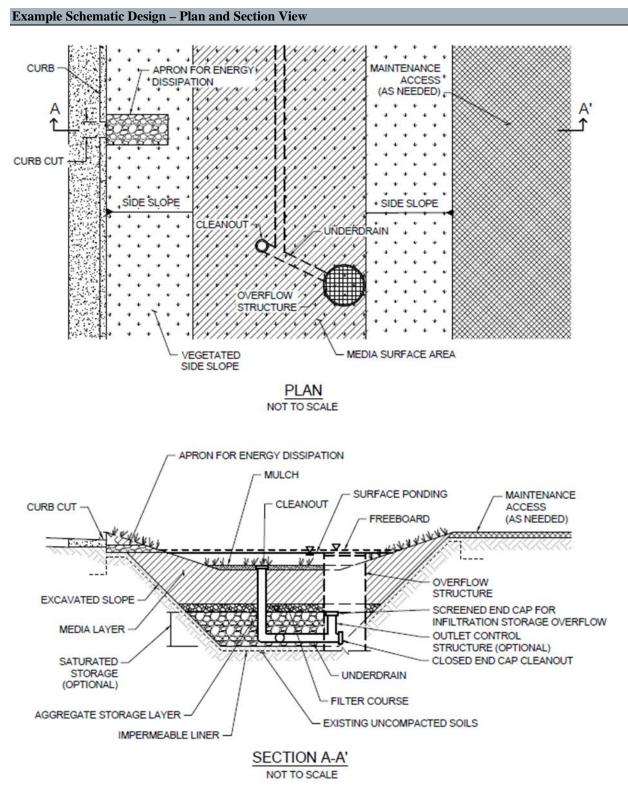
Typical Plan and Section View of a Biofiltration BMP
